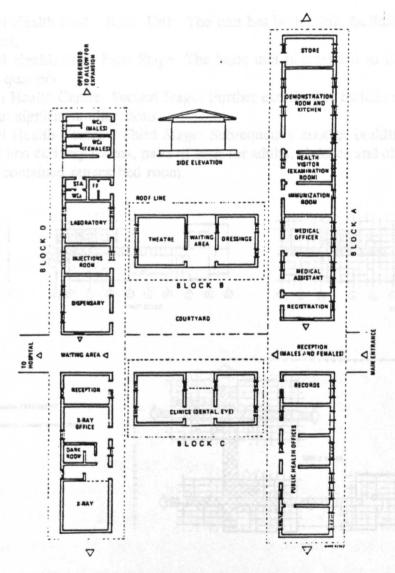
Type plan of Rural Health Centre -Sudan, Source:(6)
